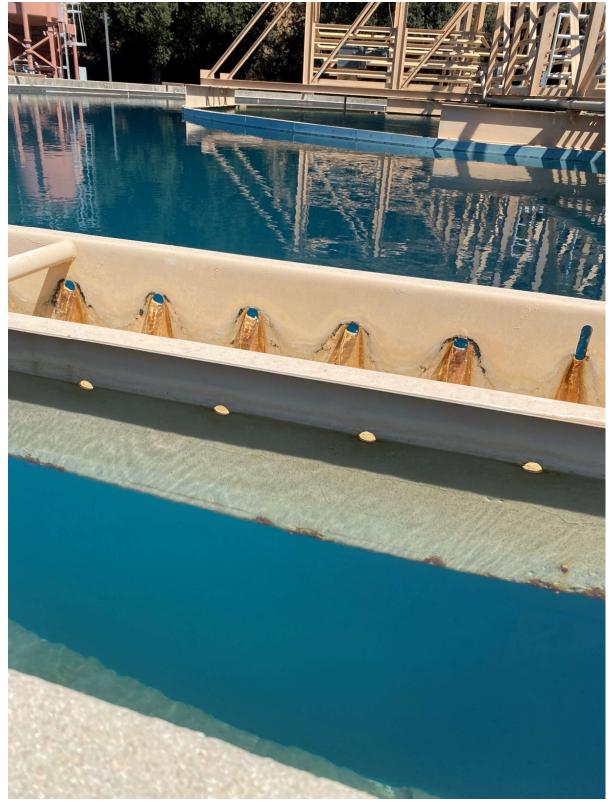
Eimco Settler (Signs of Aging and Corrosion of Mechanical Equipment)
